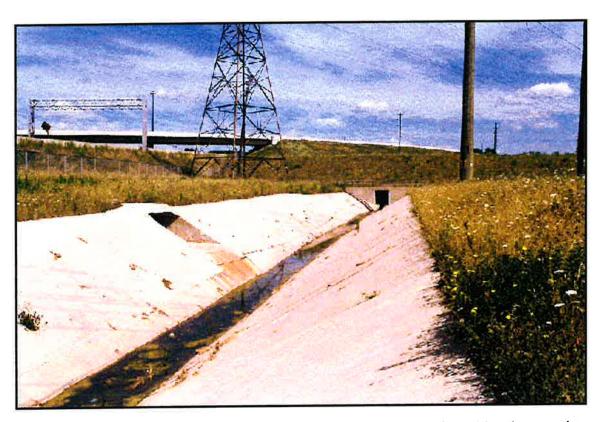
Looking downstream from station 0+300 towards the CNR Halton crossing.
